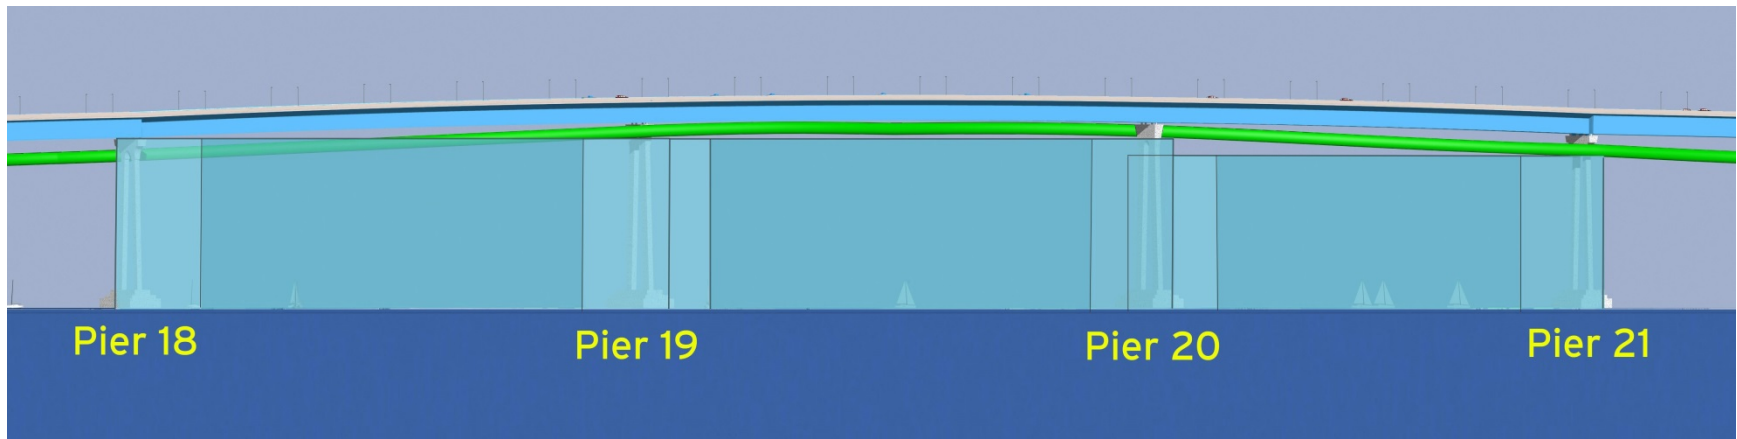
A – Close View of Side to Side Transitions at the Navigation Channels (Pier 18 - Pier 21)
